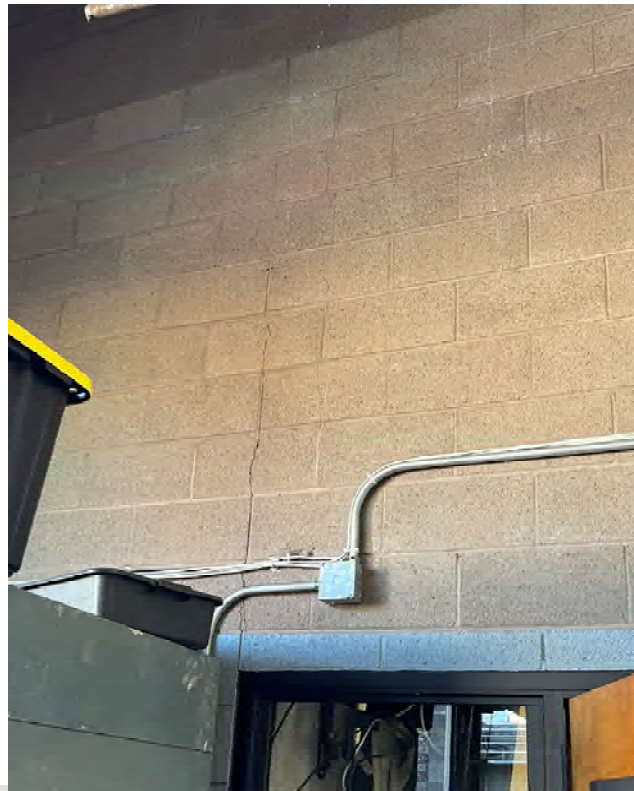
Apparatus Bay – Beam/Ledger to Wall Connection
